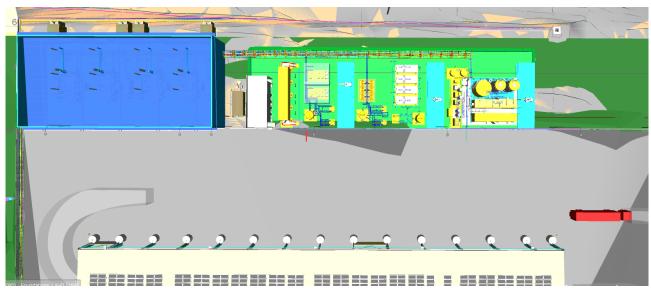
Indicative 3D model Layout including Gladstone Testing Factory and Balance of Plant (BOP)
